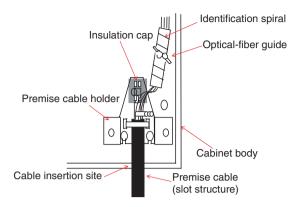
Premise optical cable holder used in PT and PD cabinets.
